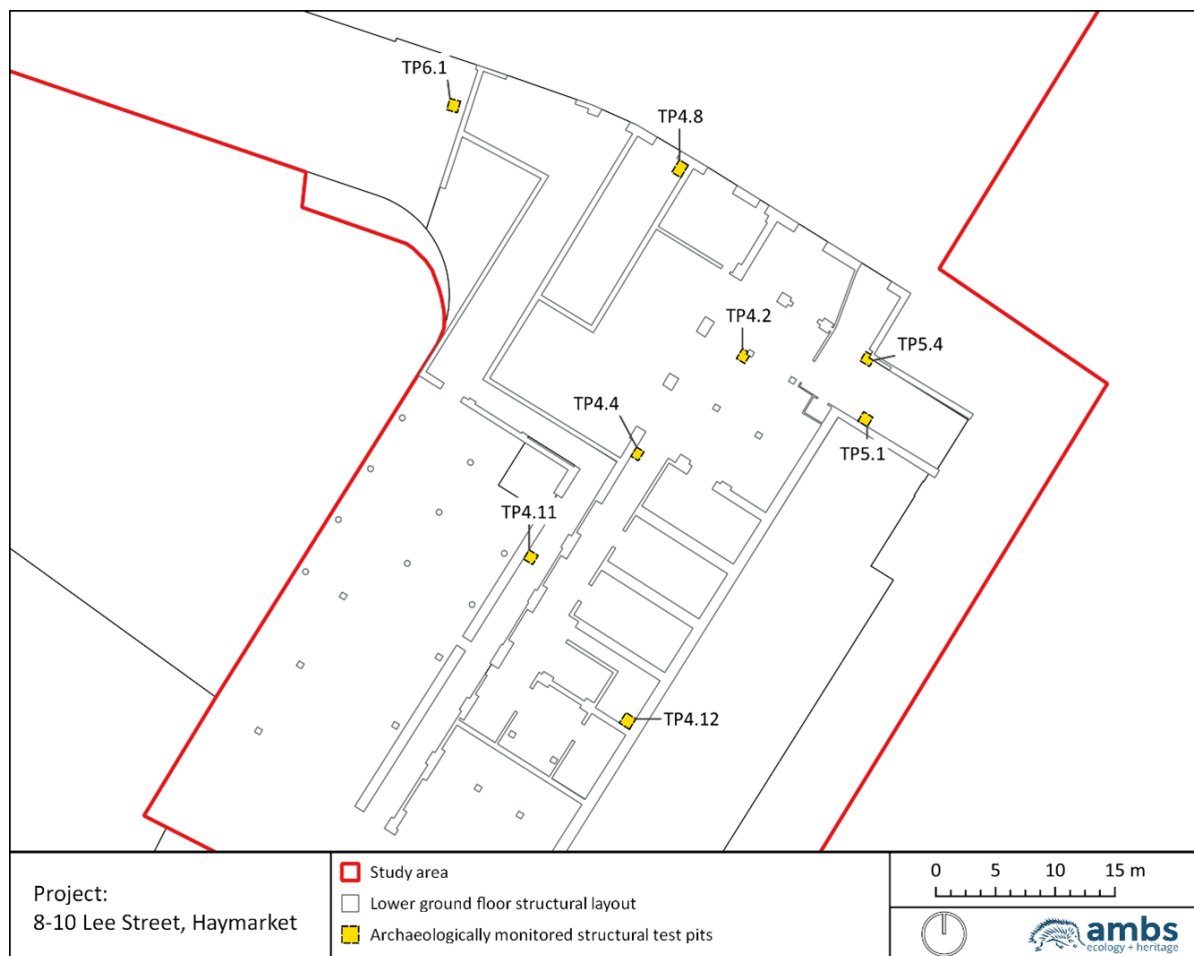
Test pit locations at the lower ground floor level, 8-10 Lee Street.
